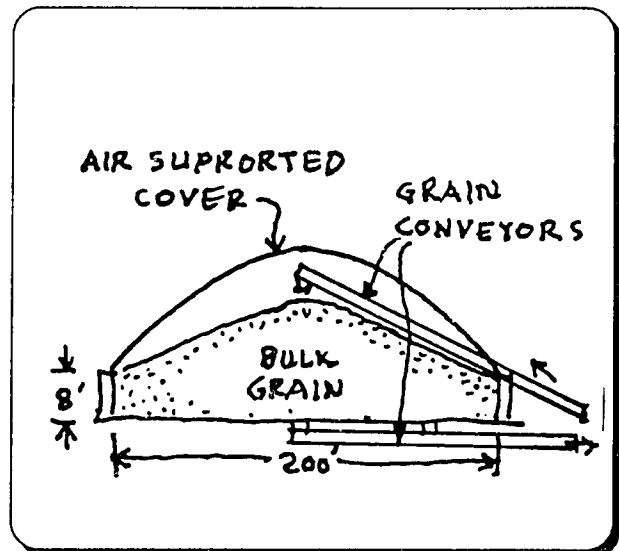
Schematic drawing of a covered bulk storage facility used in the U.S.
